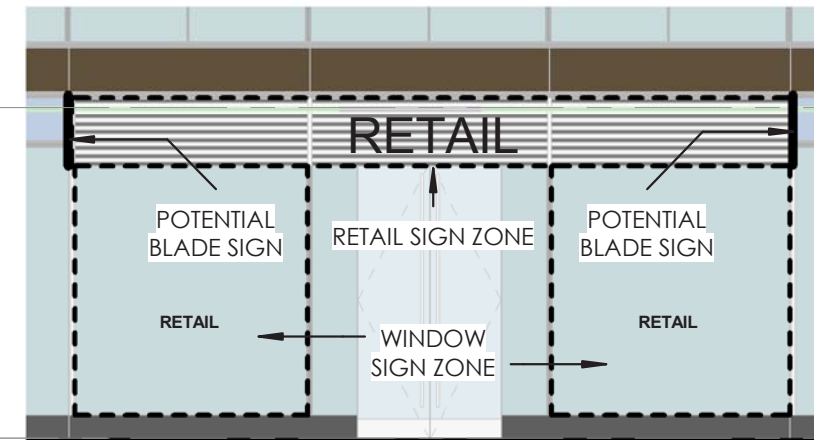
21ST STREET BUILDING IDENTITY AND TENANT SIGNS
